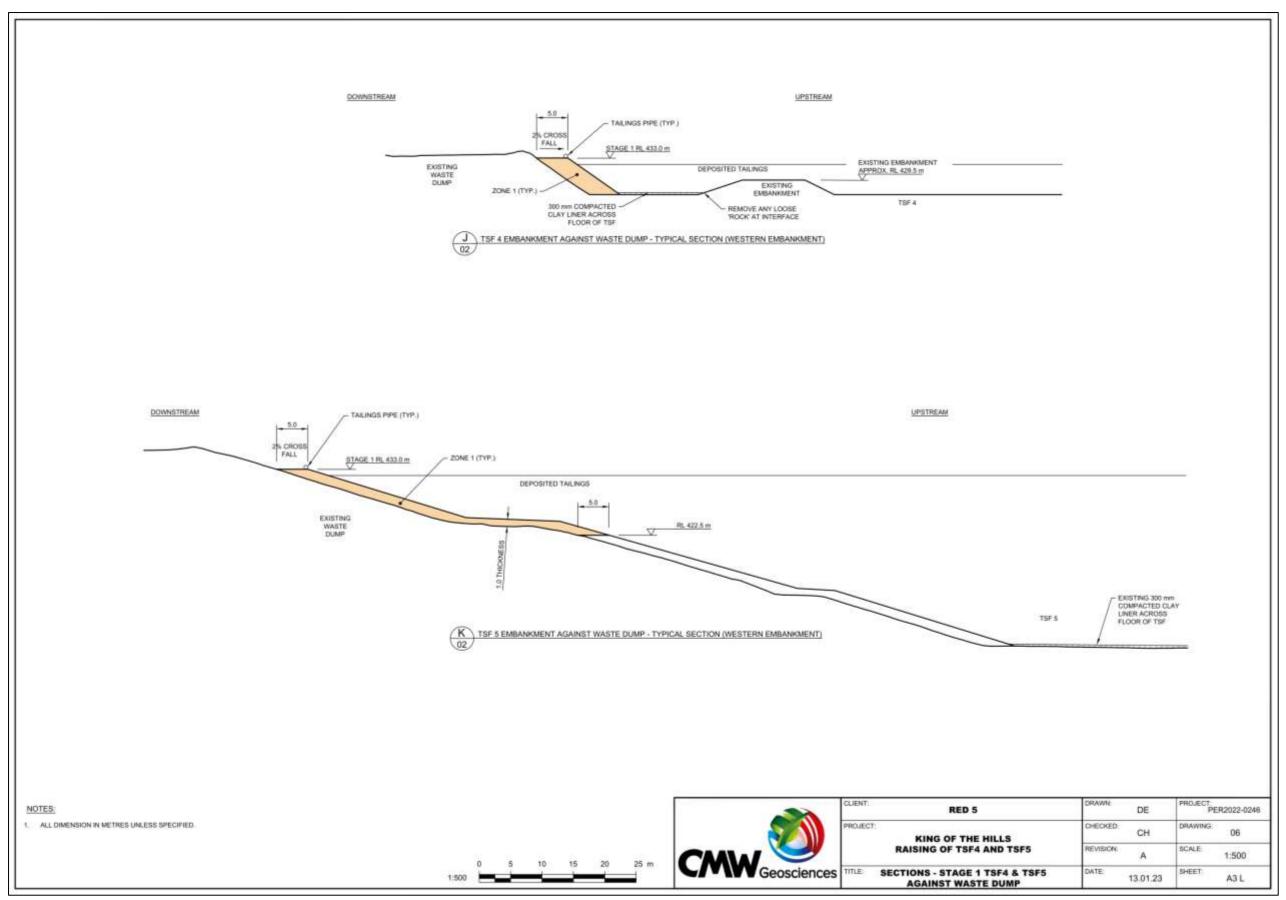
Design drawing for TSF4 Stage 1 embankment (western embankment)
